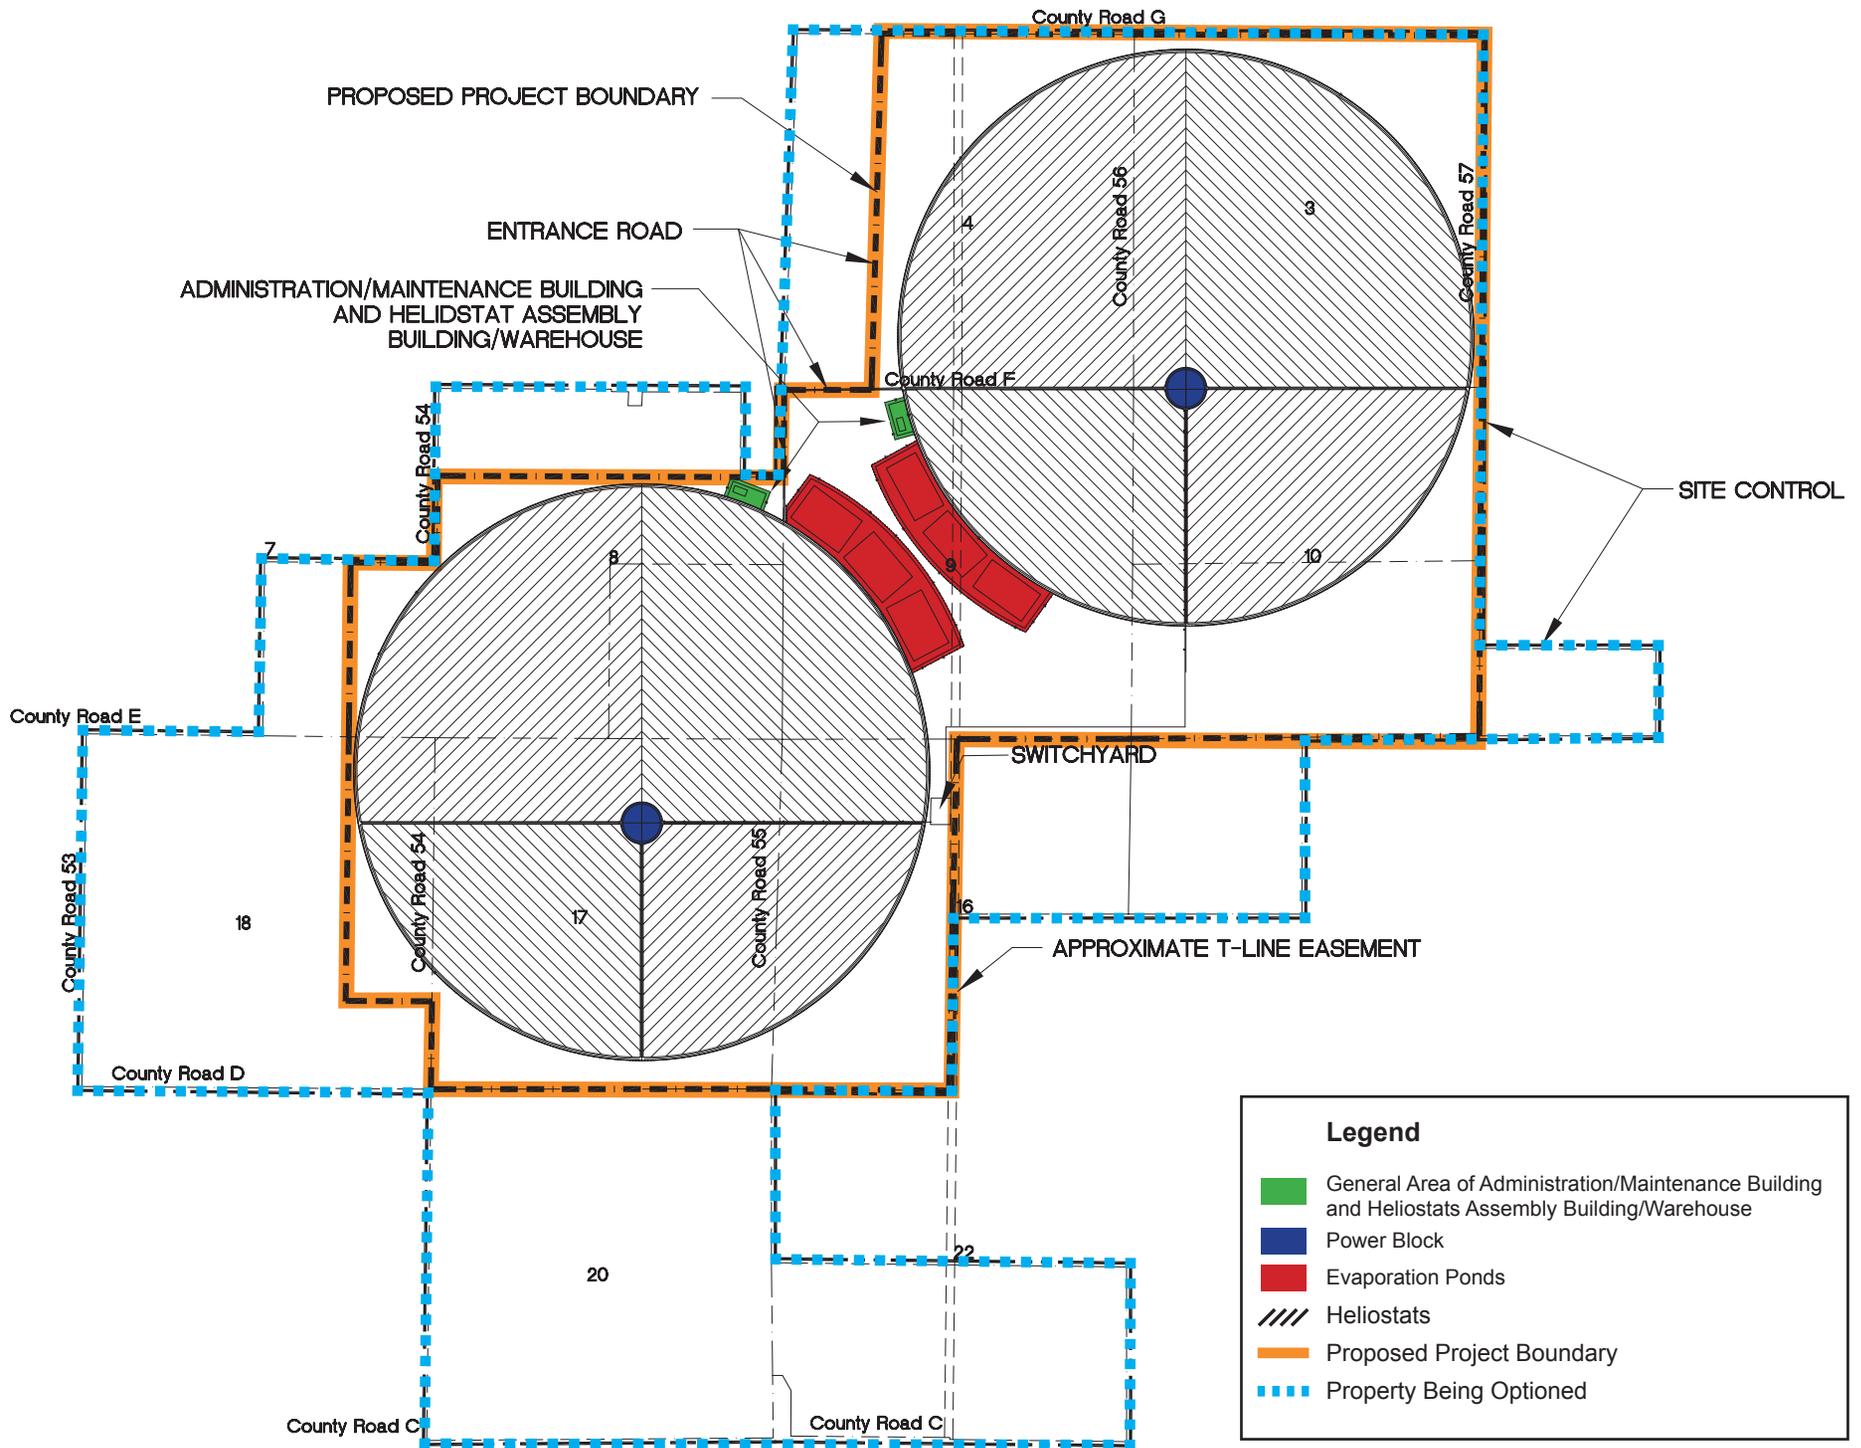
Preliminary Site Layout (Conceptual Site Layout)
